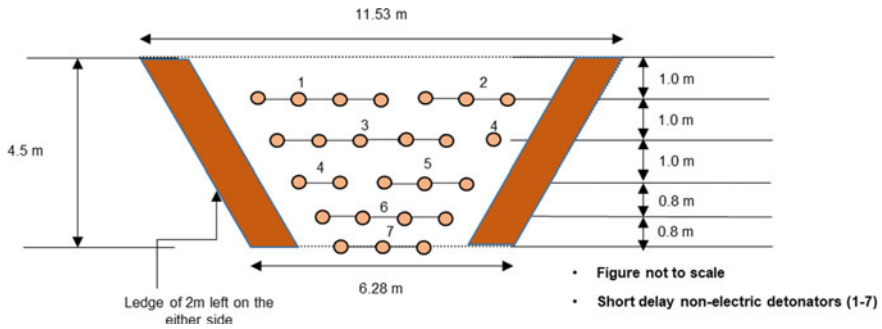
Blast design adopted for excavation of bench in head race tunnel
